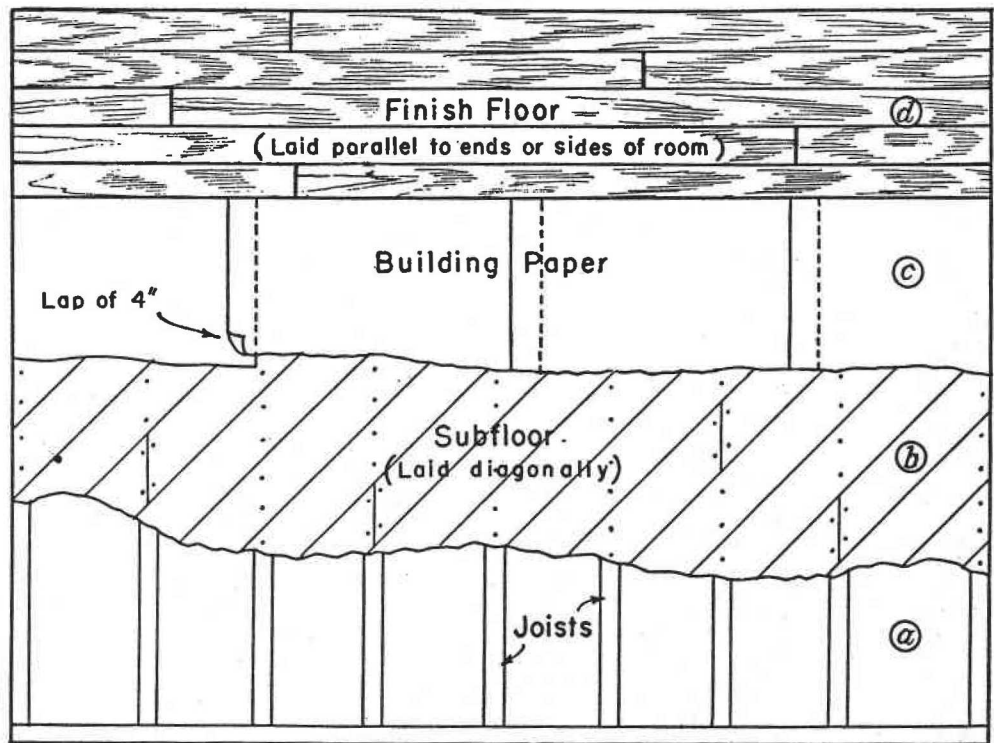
Cut-away view of floor, showing details of construction: a, Joists; b, subfloor; c, building paper; d, finish floor.
